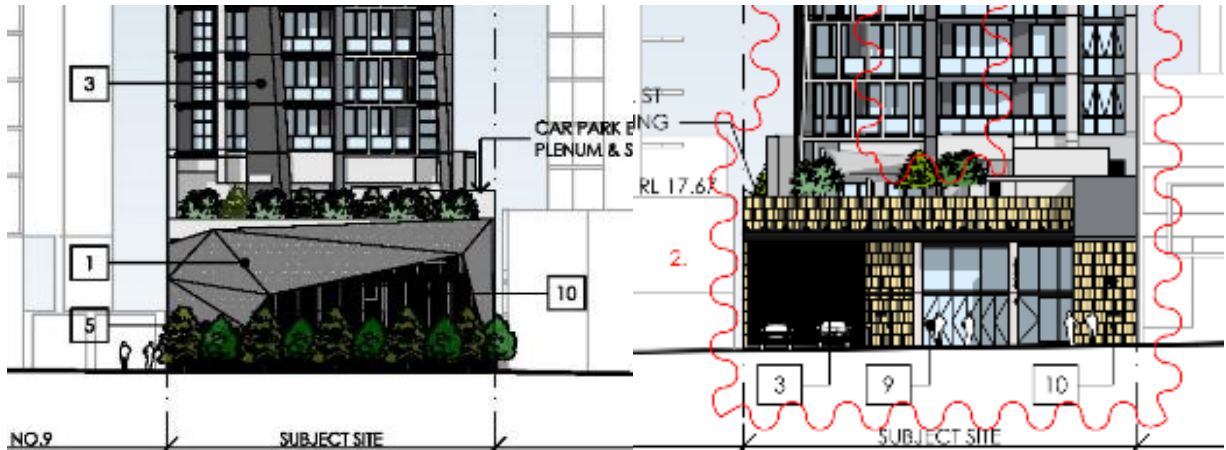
Approved (left) and proposed (right) entrance awning along Hassall Street (northern elevation).
